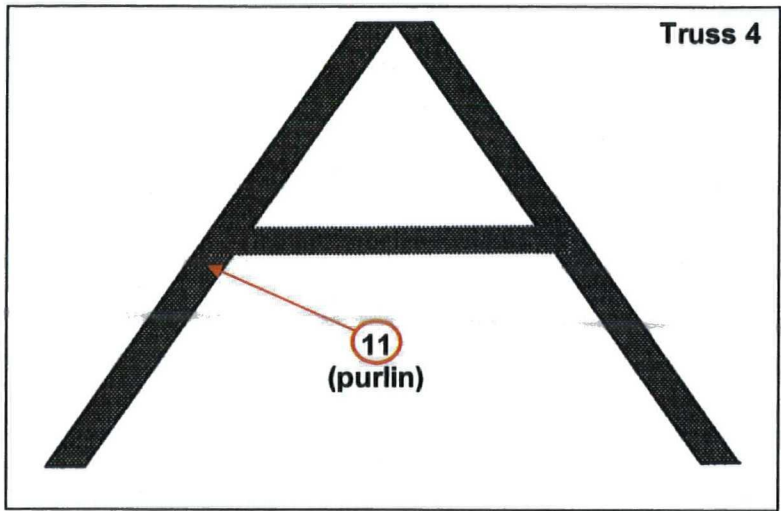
ii: Main or stables range roof trusses to show sample locations (viewed from east looking west)
